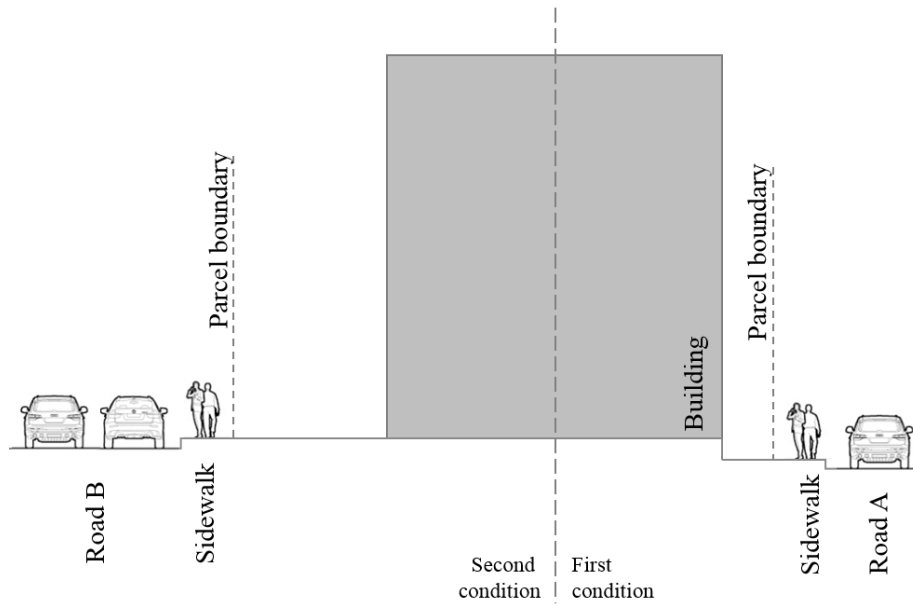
Second condition where the ground floor fails to be at least 0.50 m higher than the sidewalk facing the wider road.
